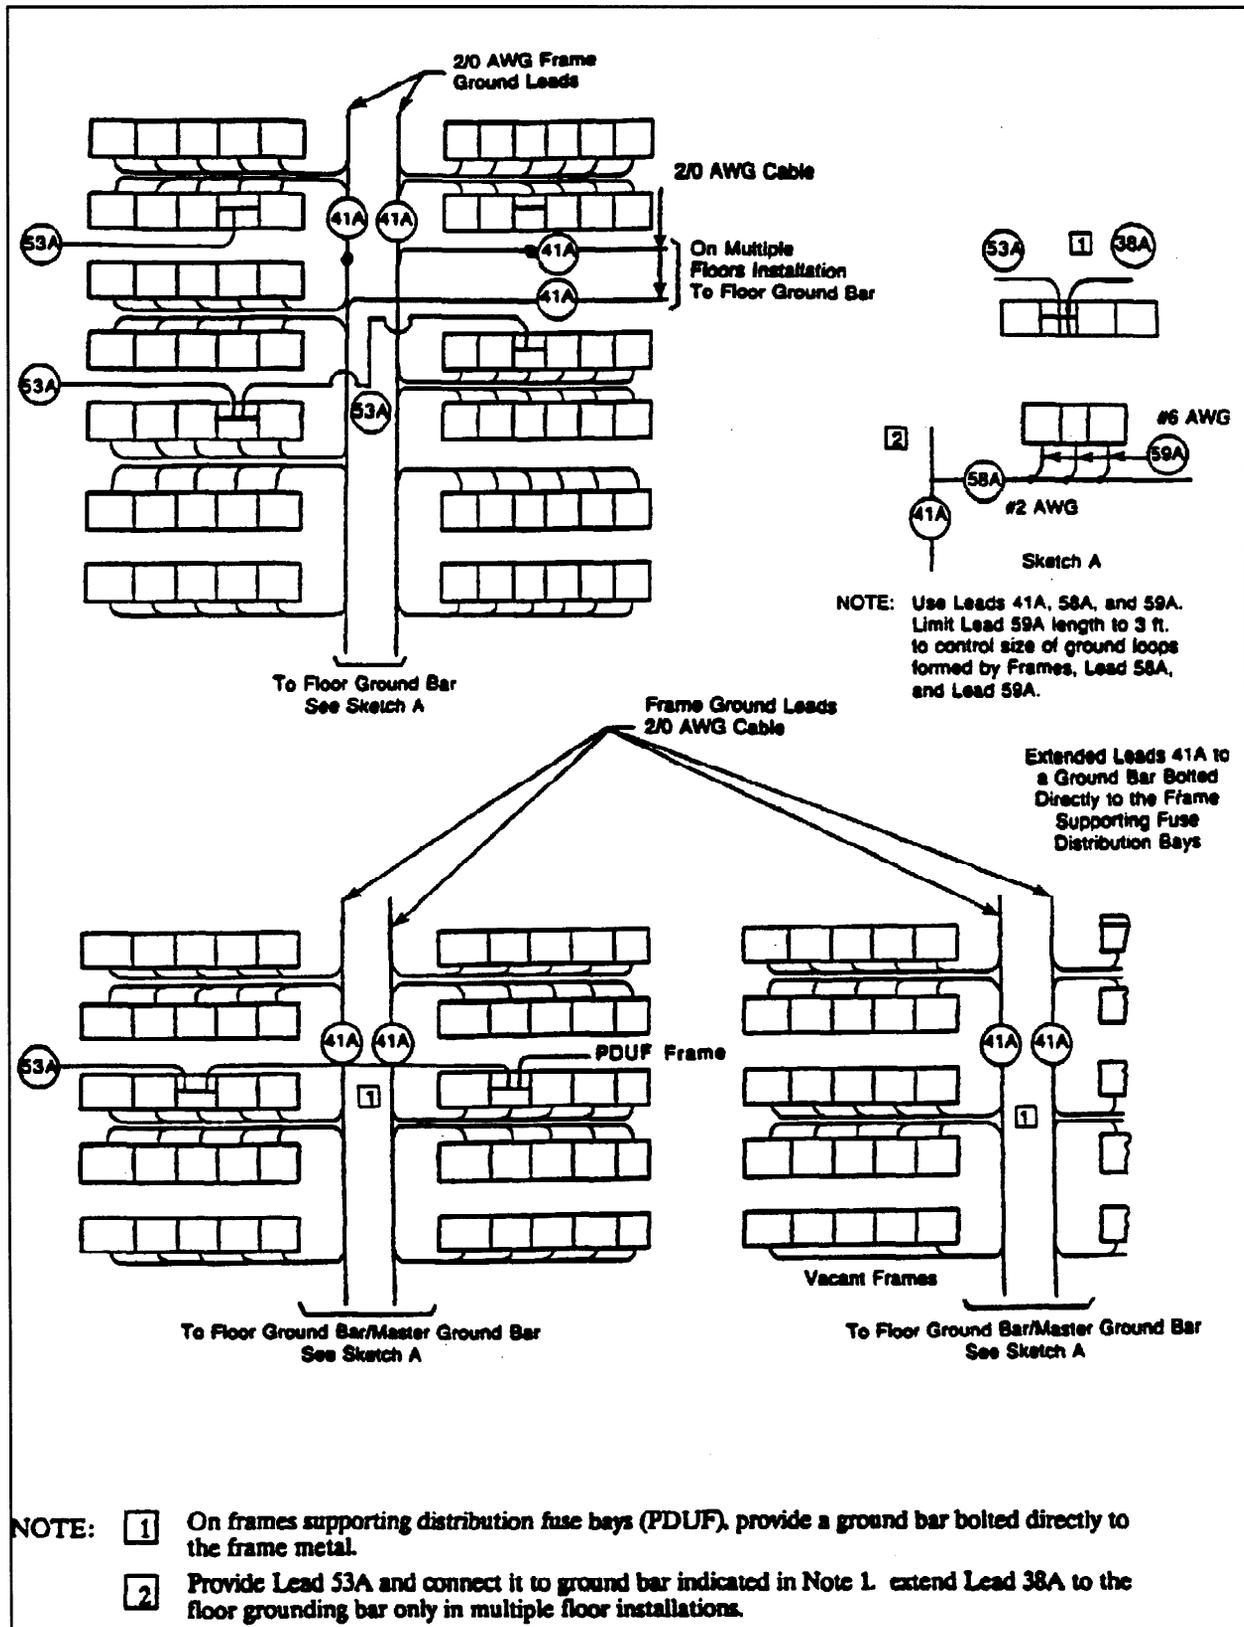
Transmission System Frame Grounding Required for New Installation or Line-ups
